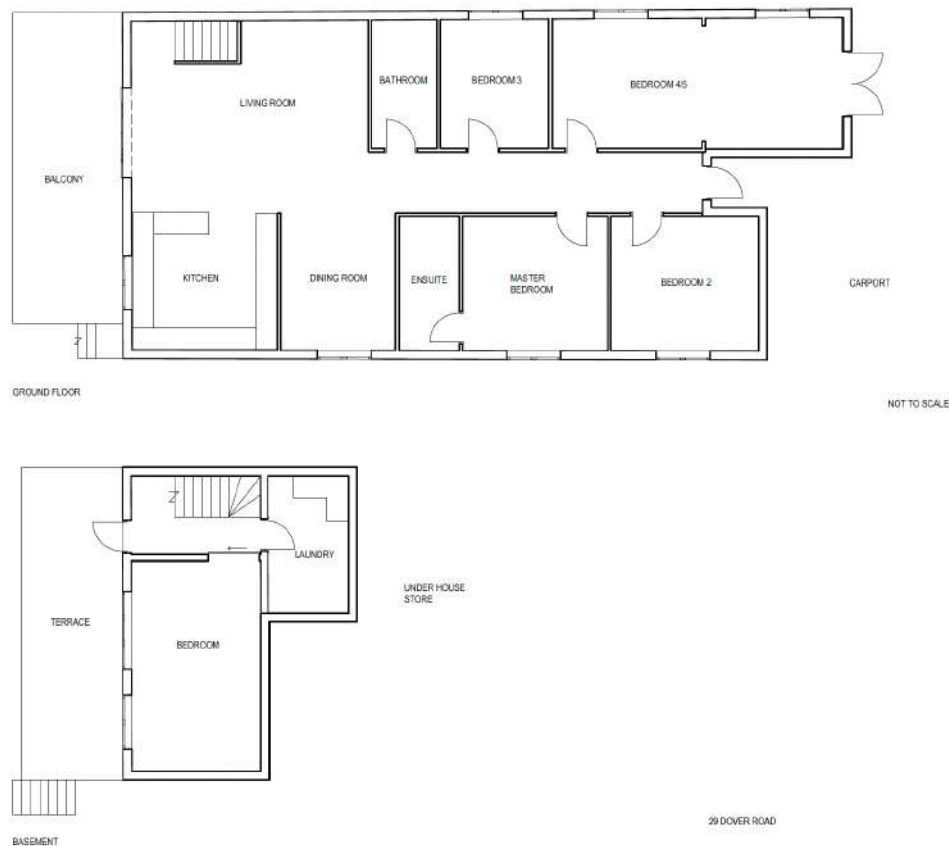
Approximate floor plan of No. 29 Dover Road. Weir Phillips Heritage, 2025.
